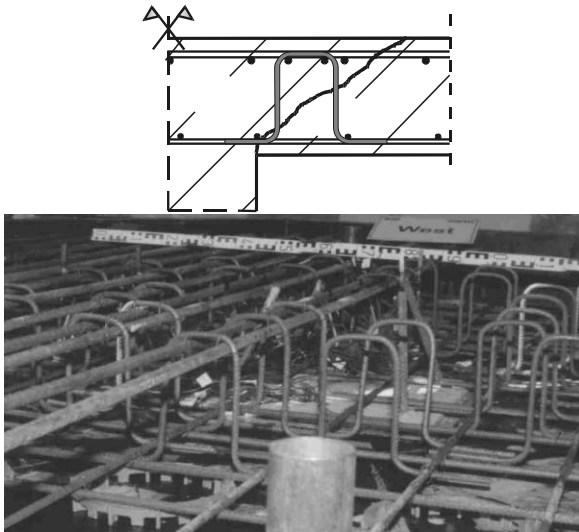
Layout II – conventional stirrups with 90° bents in the compression zone.
